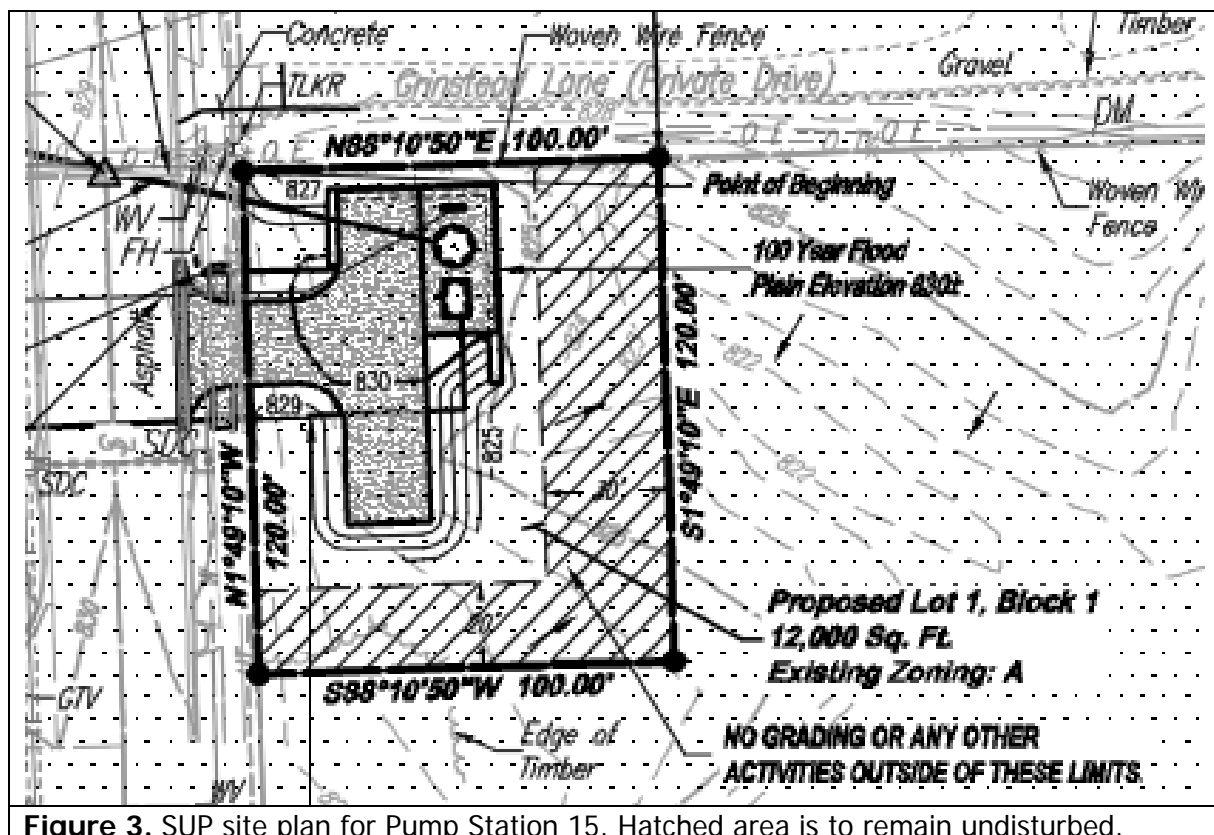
SUP site plan for Pump Station 15. Hatched area is to remain undisturbed.
